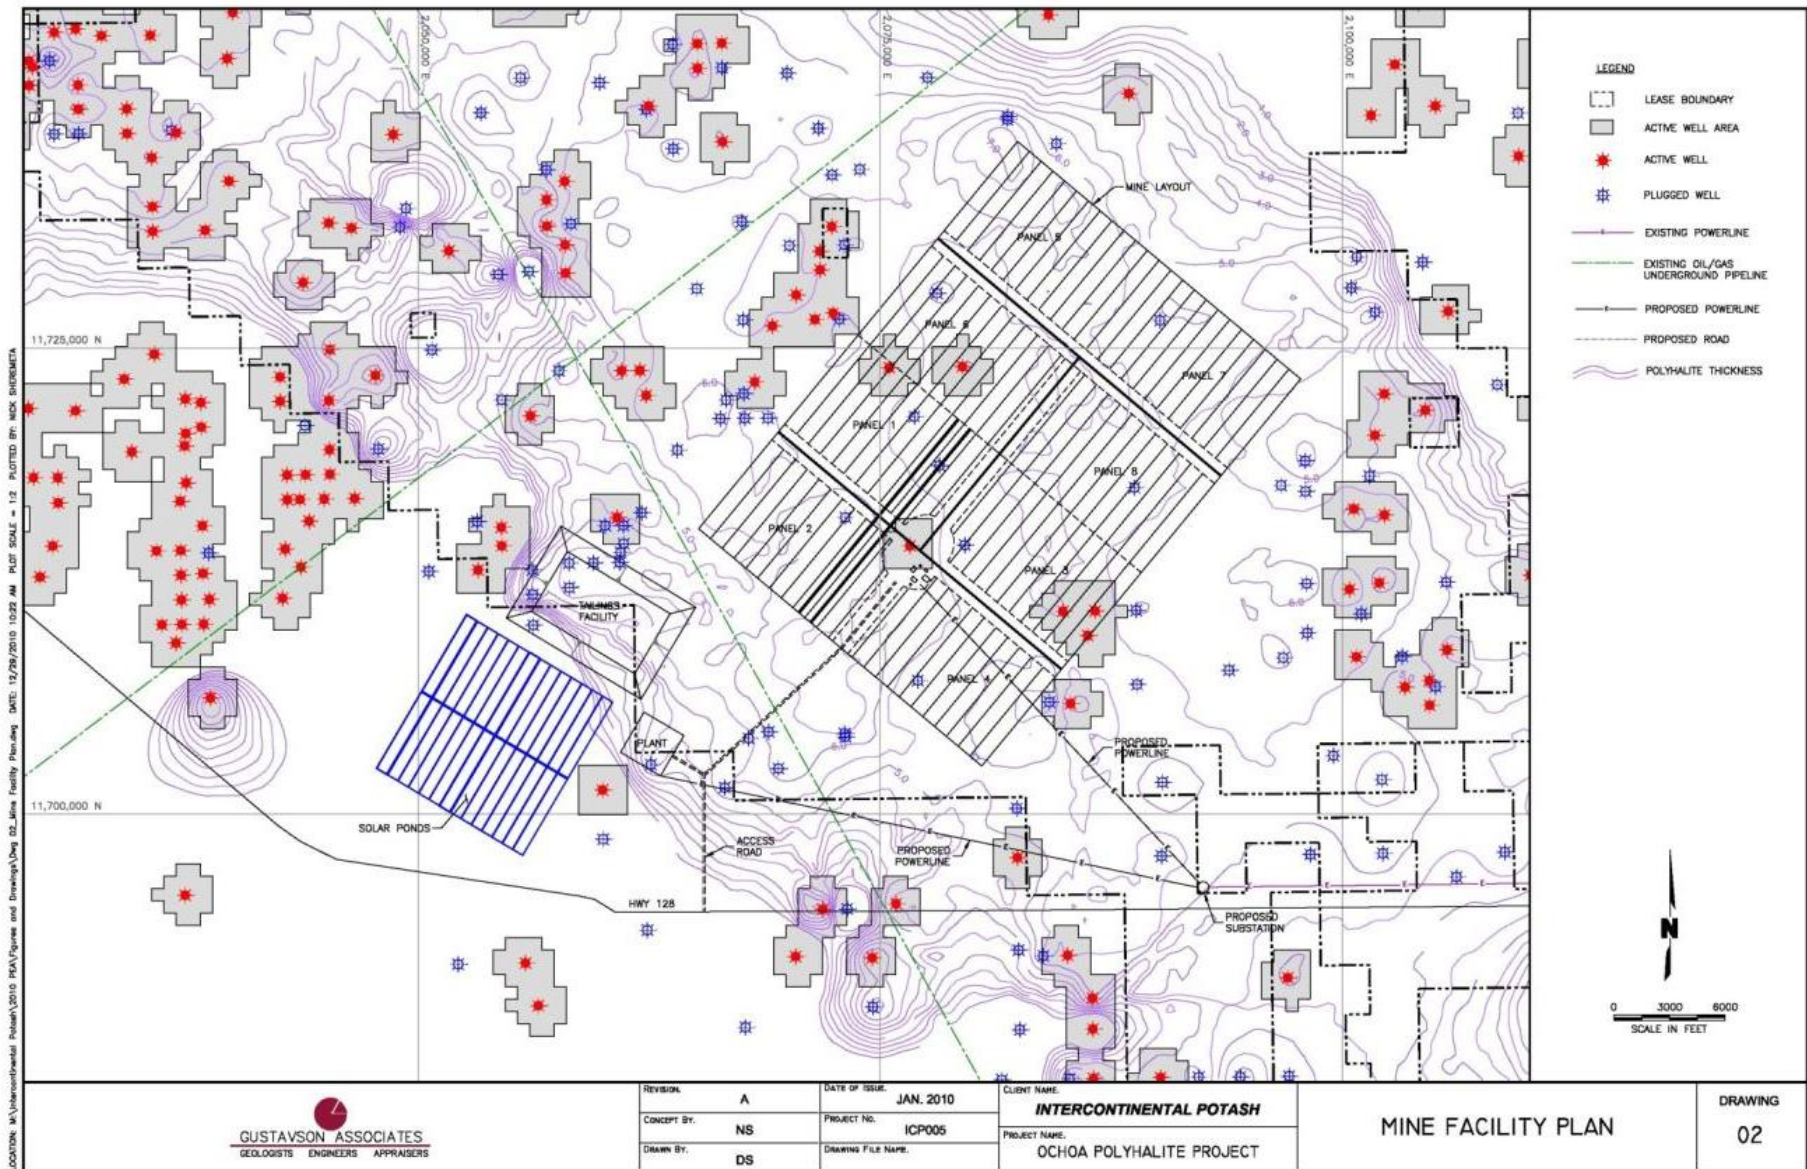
MINE FACILITY PLAN SHOWING MAIN MINING PANELS
